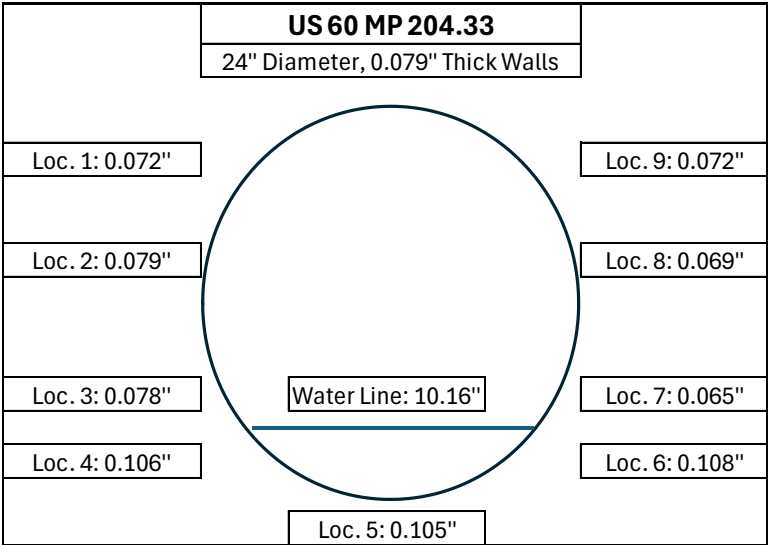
Diagram of outlet wall thickness measurements taken on US 60 MP 204.33 culvert.
